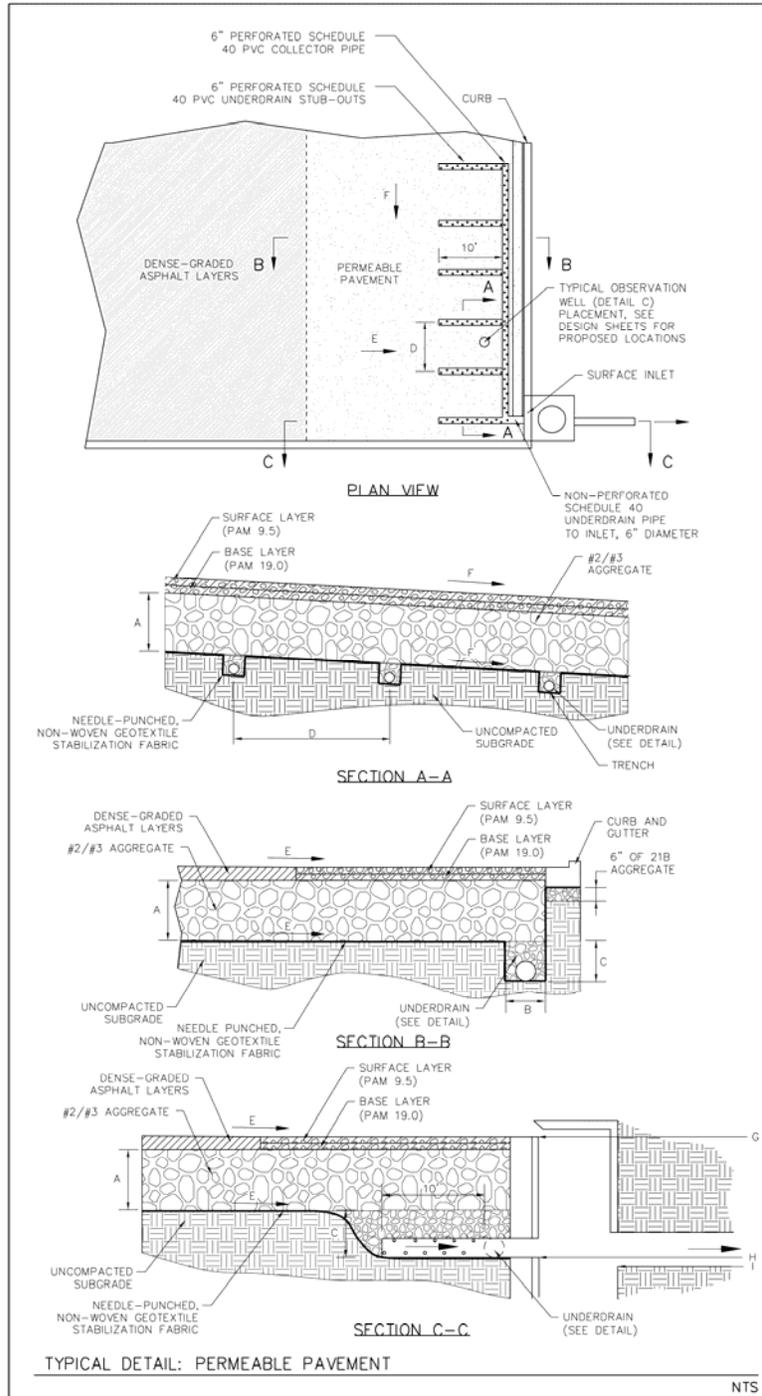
Typical Permeable Pavement Detail (Parking Lots) (VDOT SWM-5, Filtering Practices, 2014)
